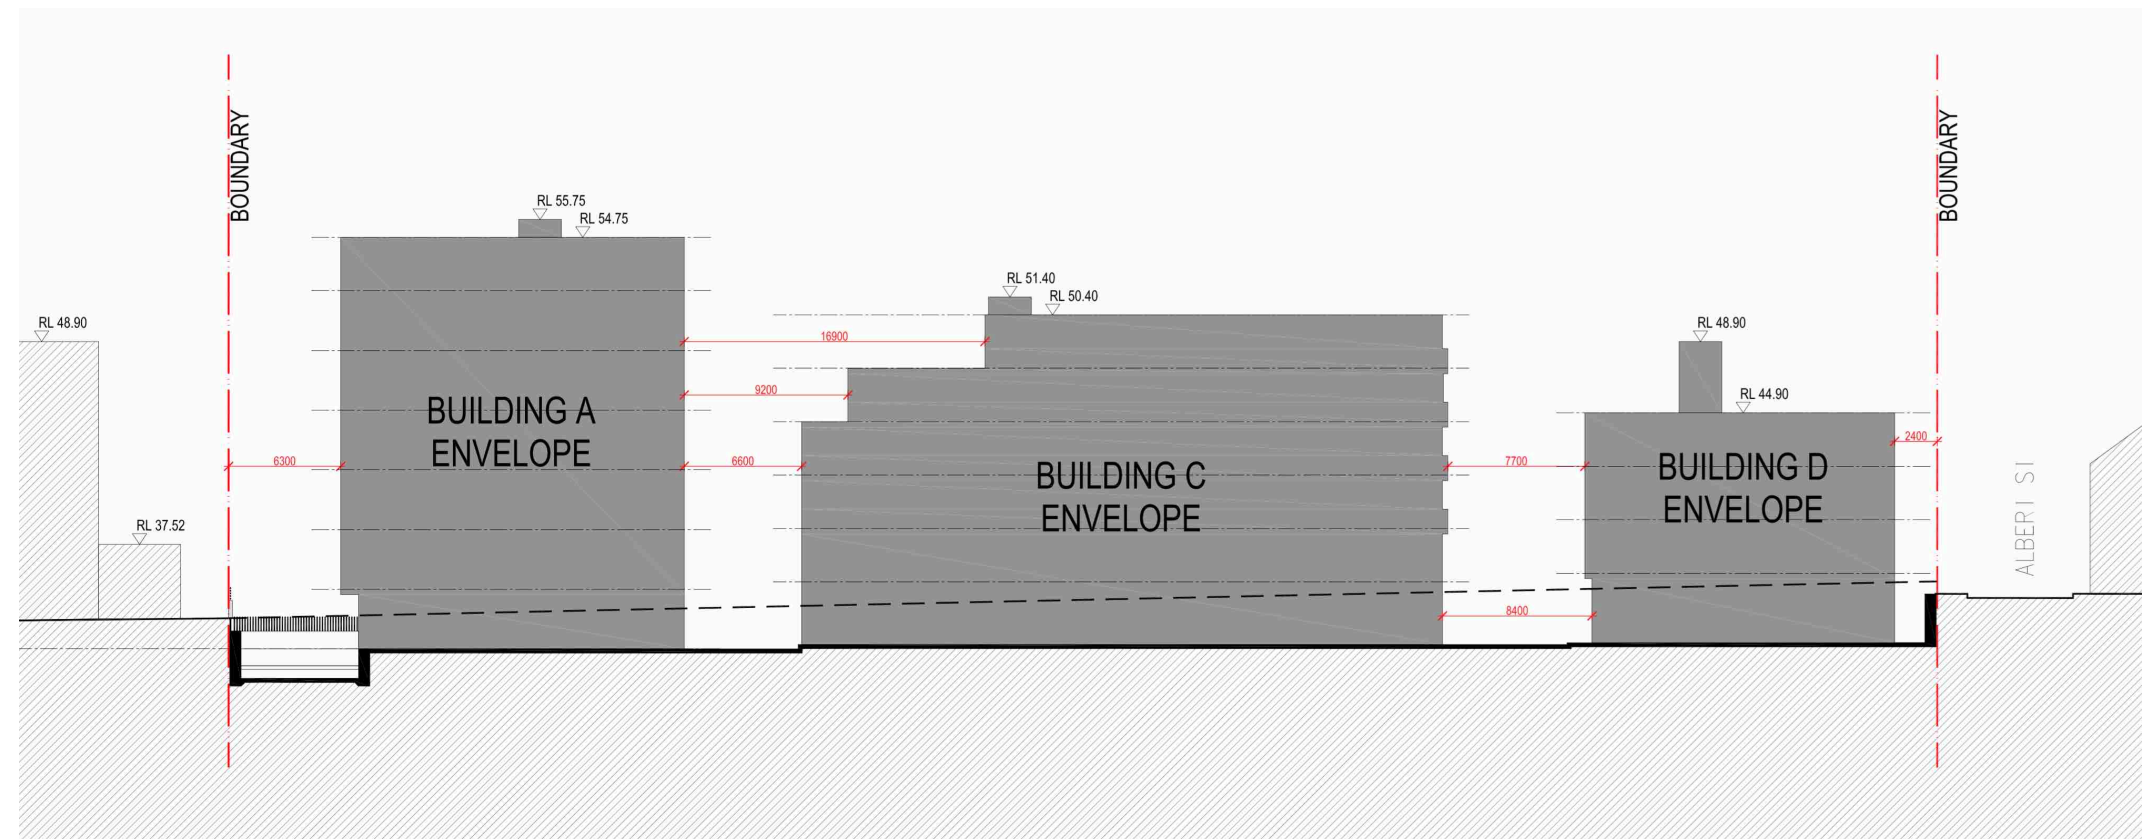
Extract from proposed Concept Plan modification, increasing the height of Buildings B and C.
